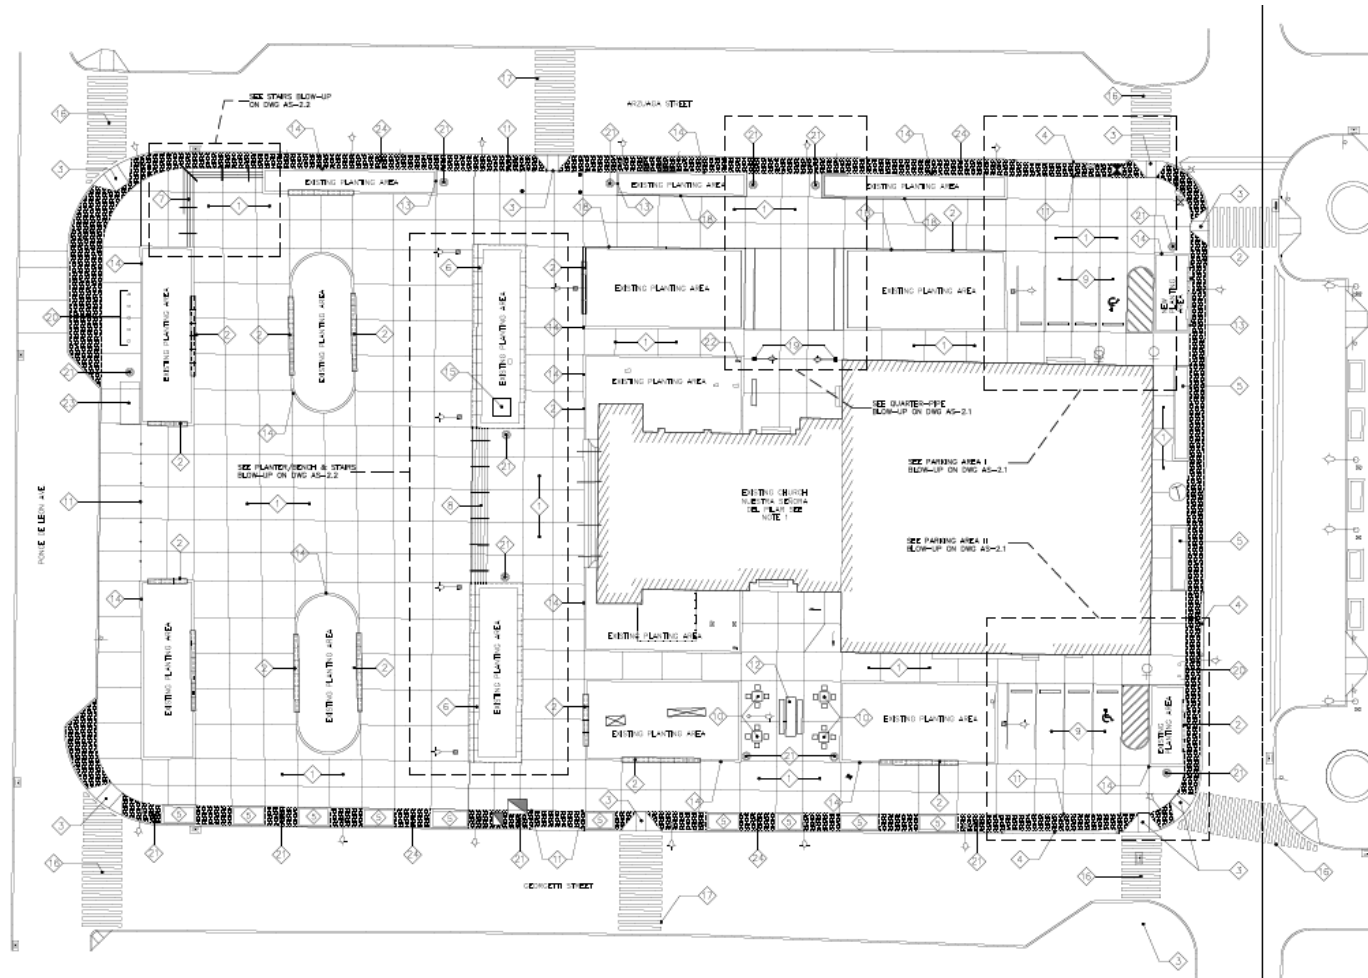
Plaza de la Convalecencia. Proposed plaza site plan. (Source:Source: Drawing AS-3.0, Hernández-Bauzá PSC Architects, 2024)
